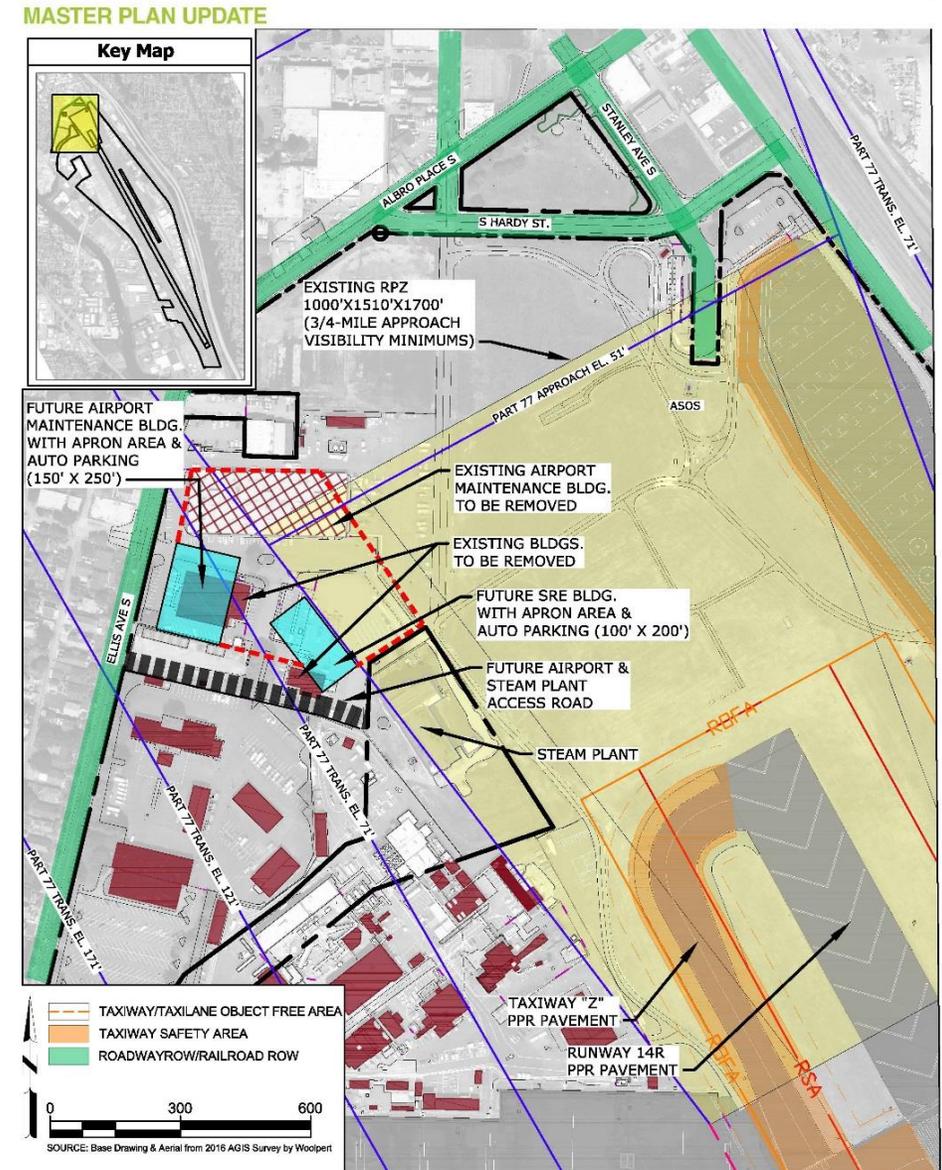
L Future Airport Snow Removal Equipment (SRE) & Maintenance Buildings Area (Option One)
